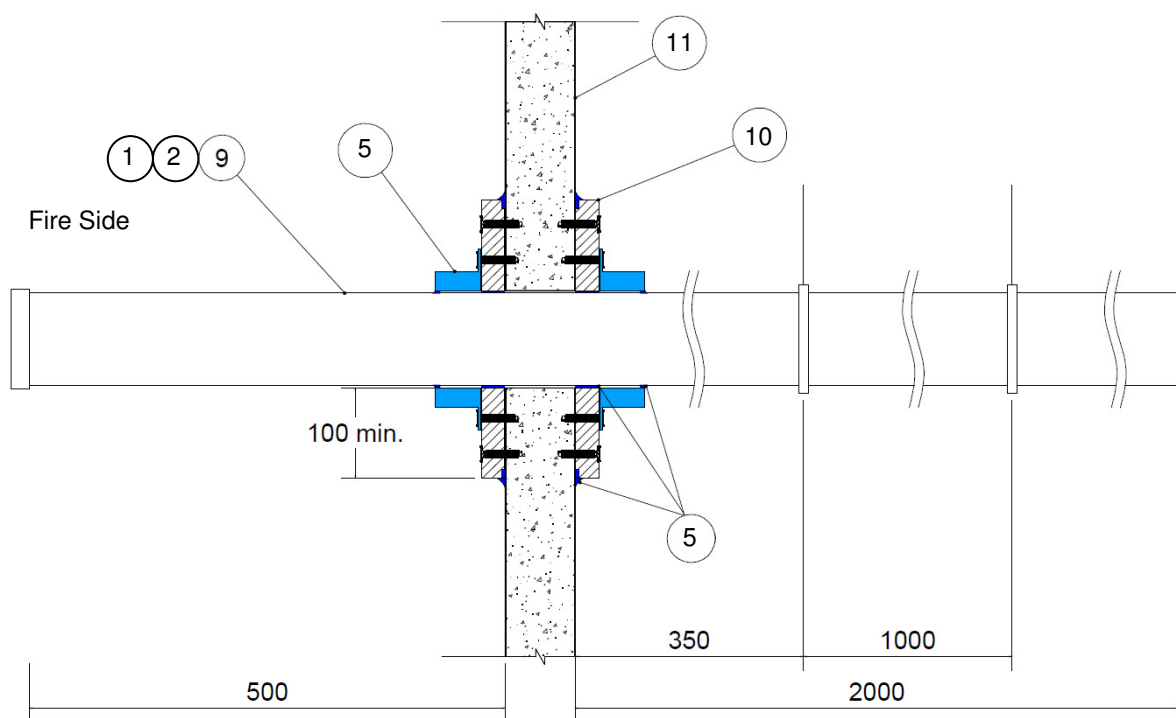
Plastic Pipes with PROMASEAL® FC Collars (Floor Side View)
